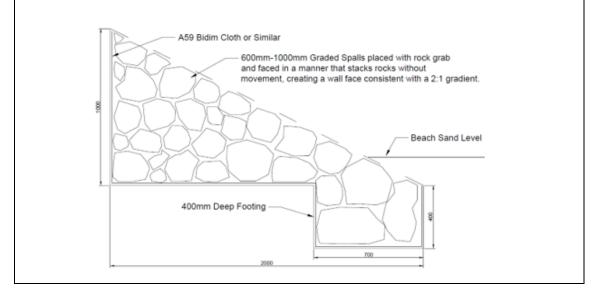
THE PROPOSED TAIPA SEAWALL DESIGN (Courtesy of D James 1.09.21).
